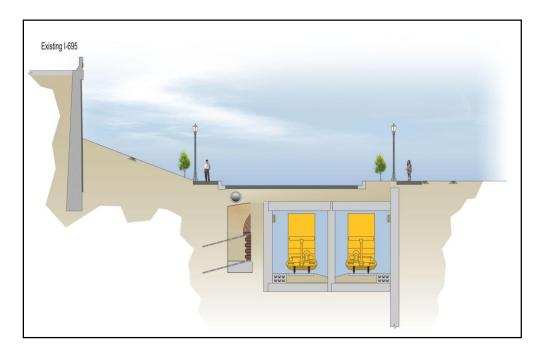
Cross Section View of Post-Construction Alternative 2 between 3rd Street and 9th Streets SE
